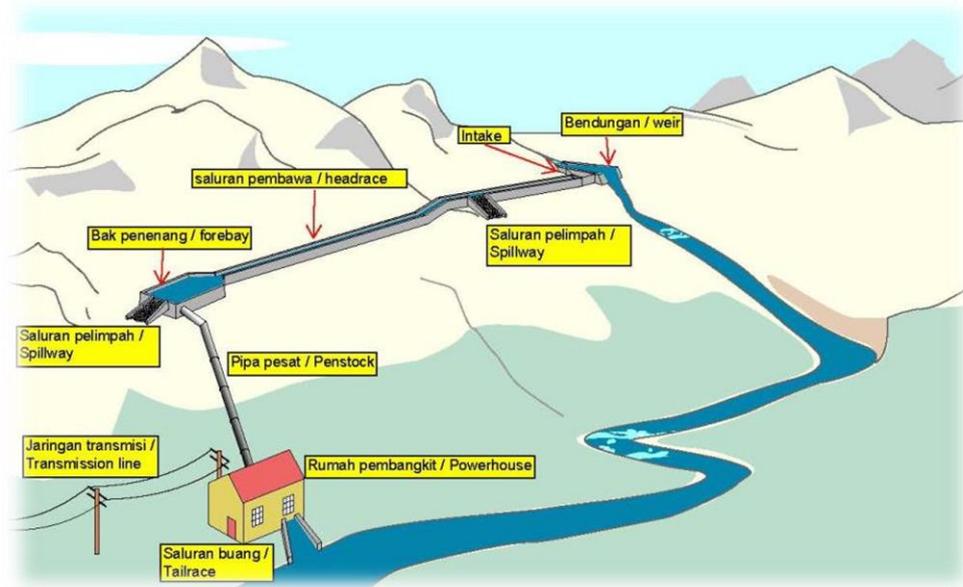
Diversion Hydropower Plant Construction (source: imgarcade)
